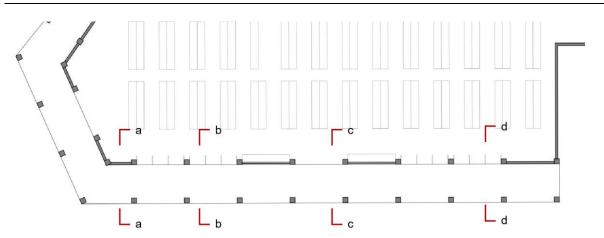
Floor Plan of Leung Kee International Duty Free Mall (formerly the First Mall) (Source: Drawn by the Author)
